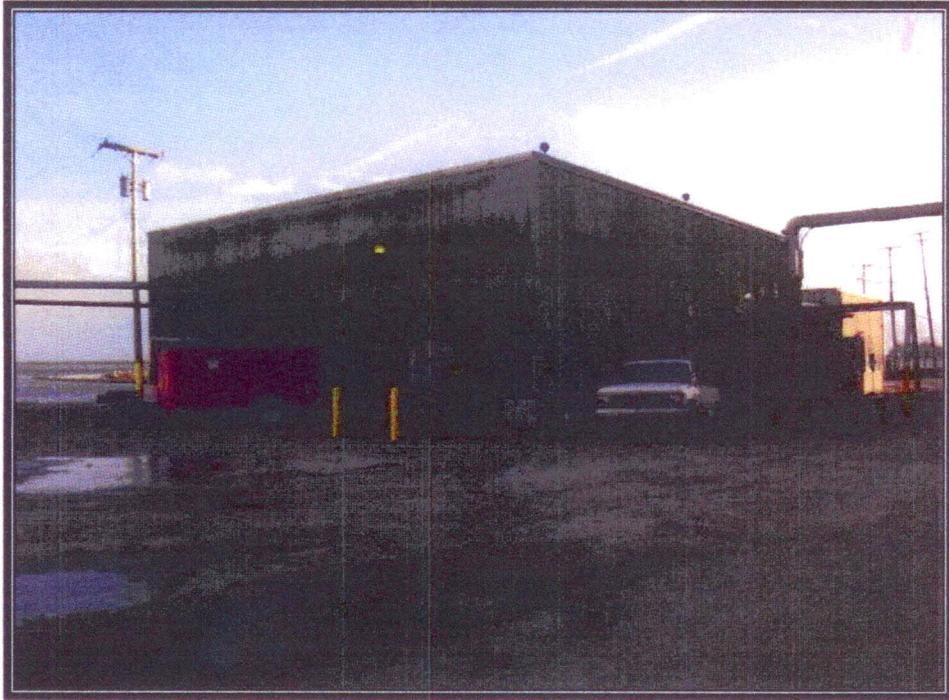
View of plant services building looking southeast (Photograph by RCG&A, 2008)
